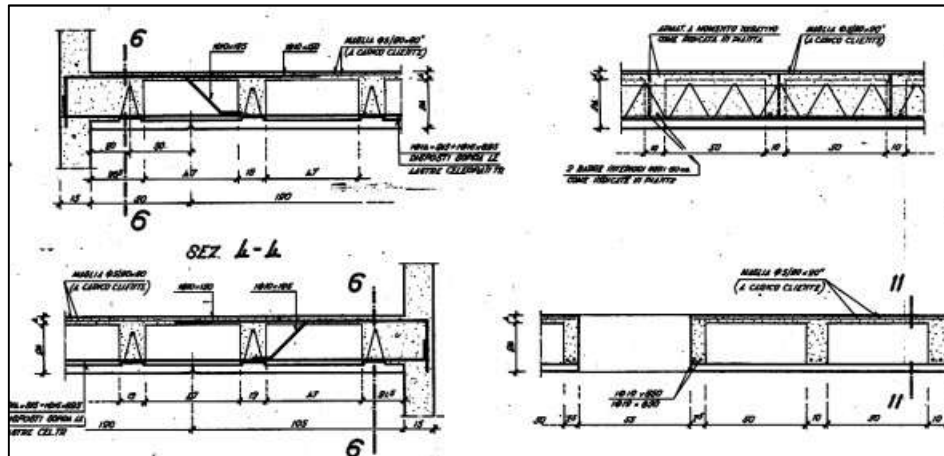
Typical sections of Celerpan slab. (D/7509_F165.2 T9)
